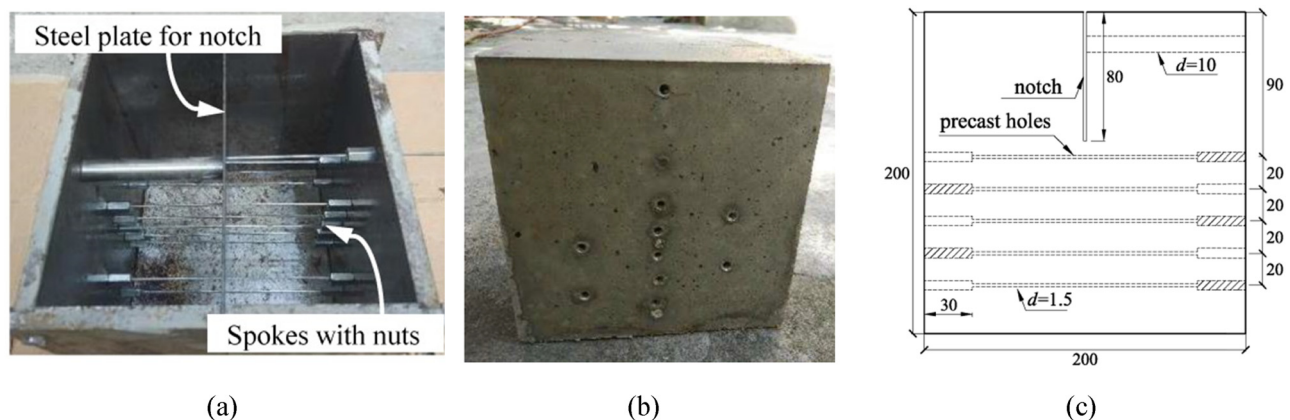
Configuration and casting of the test specimen (unit: mm). (a) Photograph of the mold; (b) photograph of the specimen; and (c) section view along the center.
